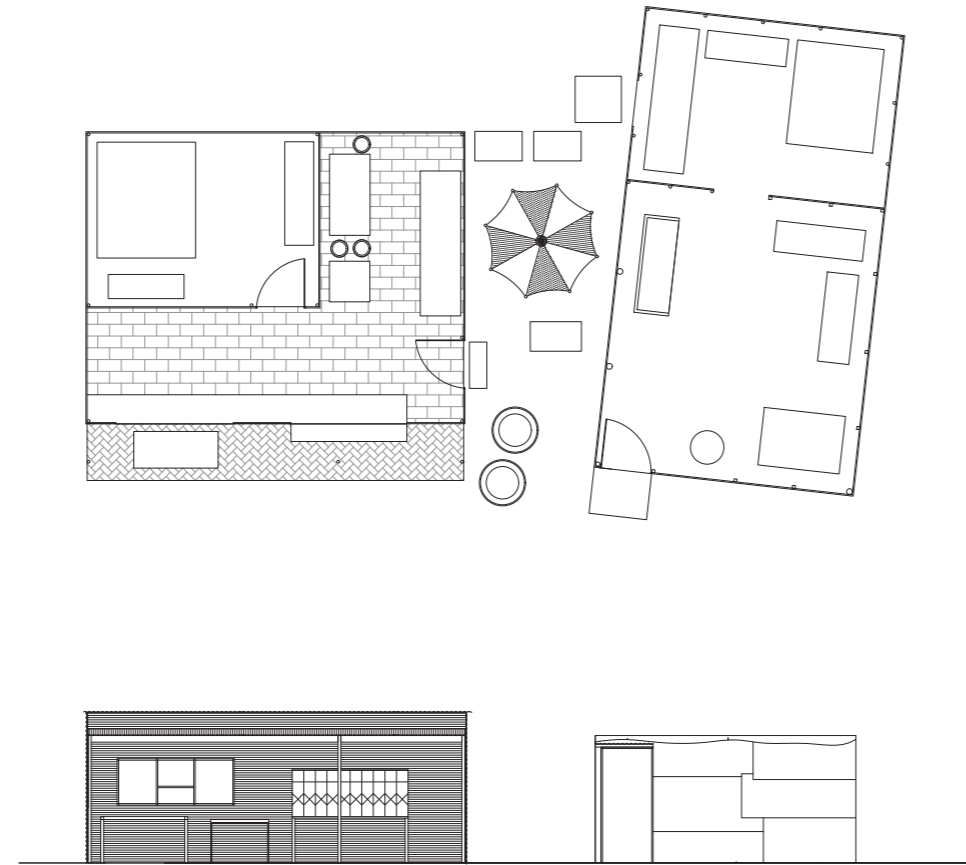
As built drawings for Numsa and her families dwellings (Author 2022)
